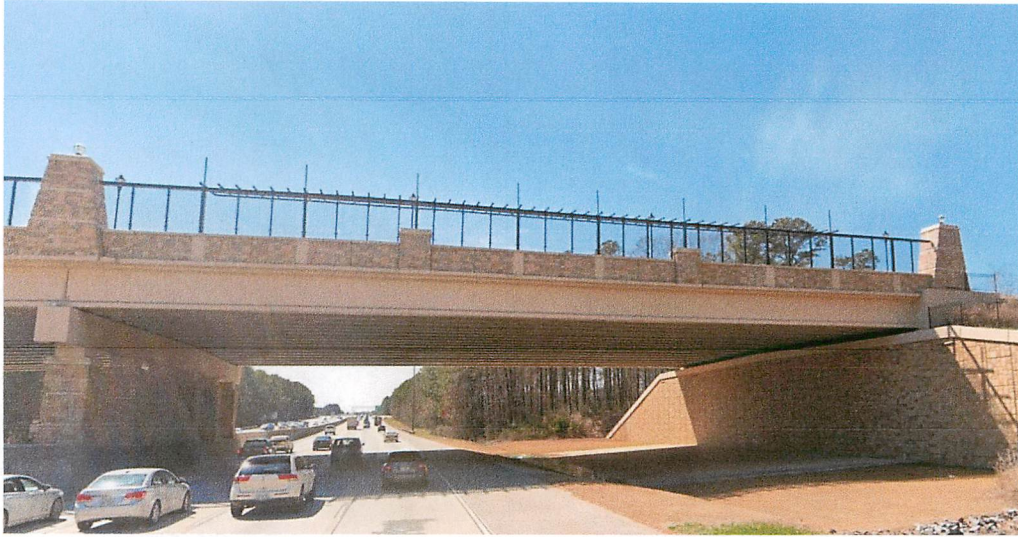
Encore Parkway Bridge, Alpharetta, GA using Blub-Tee Girders; Image from Google Earth
